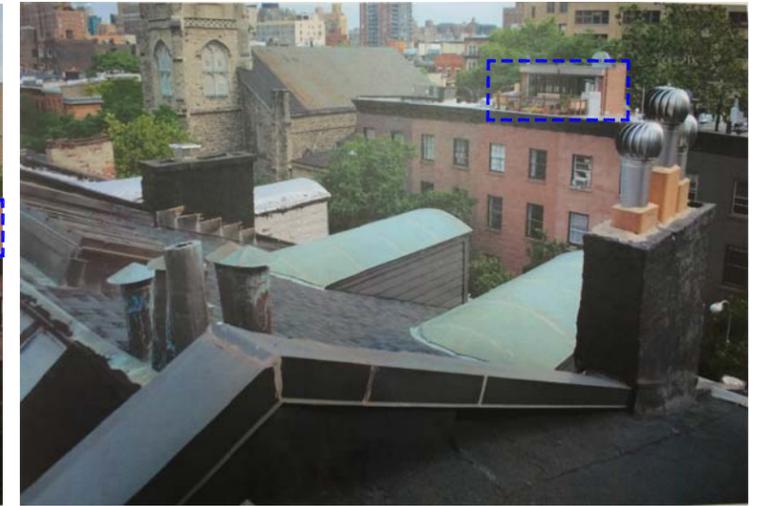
VIEW LOOKING SOUTHEAST FROM ROOFTOP
